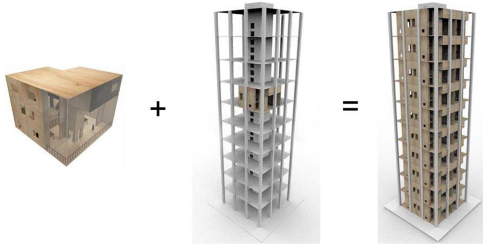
Concrete coupled core with concrete flat slabs at every third floor as a main structure, and the prefabricated wood modules as substructures [12]
